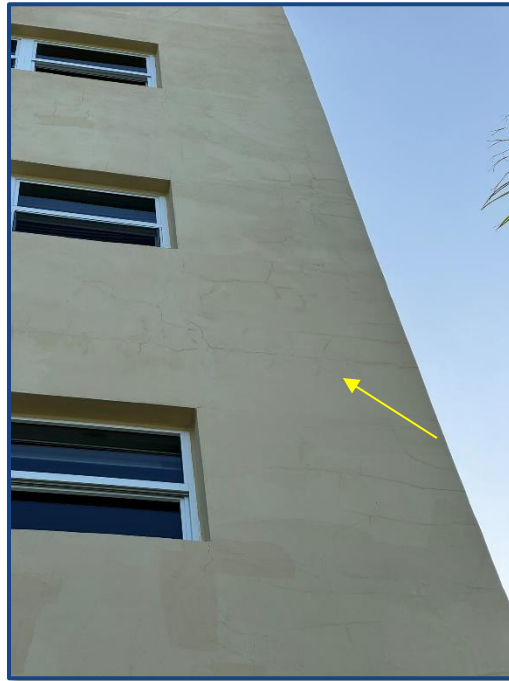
Wall cracking observed at X01 window riser.
